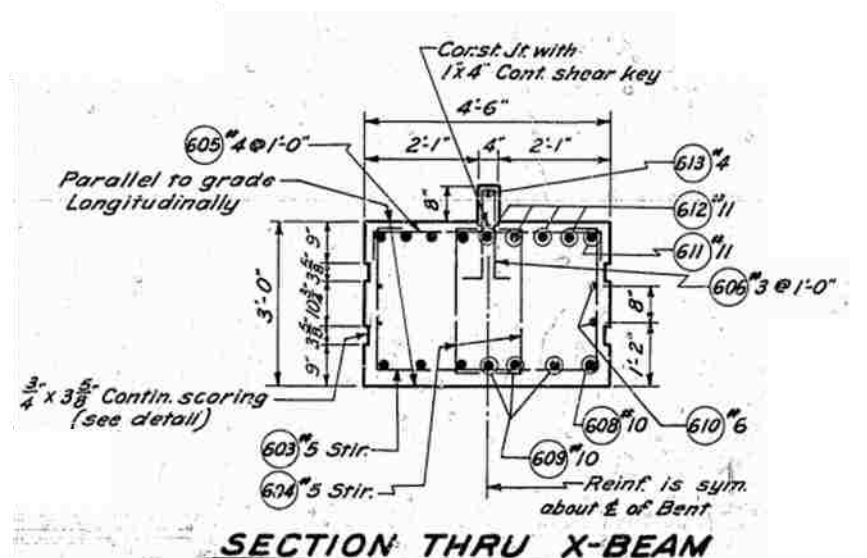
Cap beam cross-section for typical bent (Galer-Lakeview)
